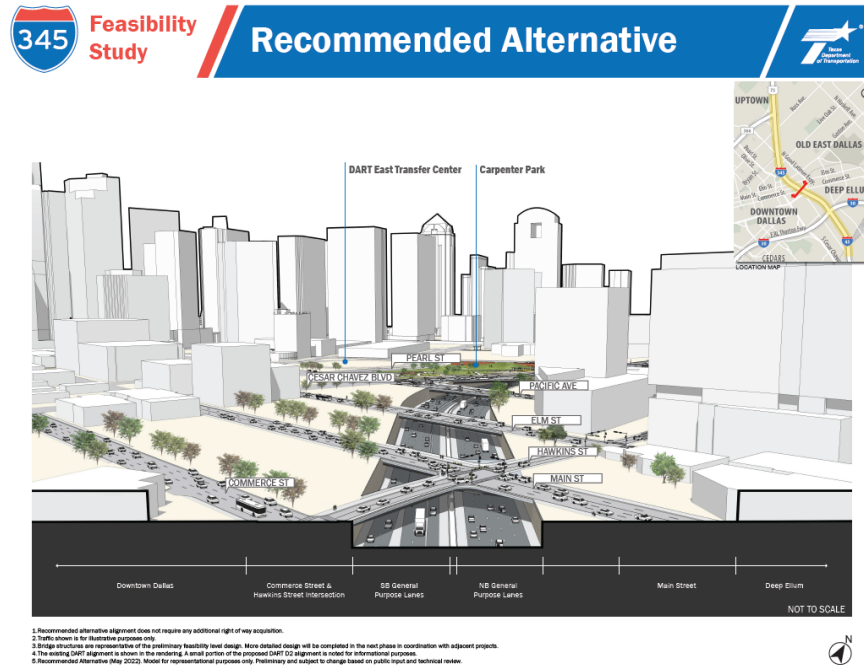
Recommended Alternative 3D Rendering Facing North Towards Main and Elm Streets
